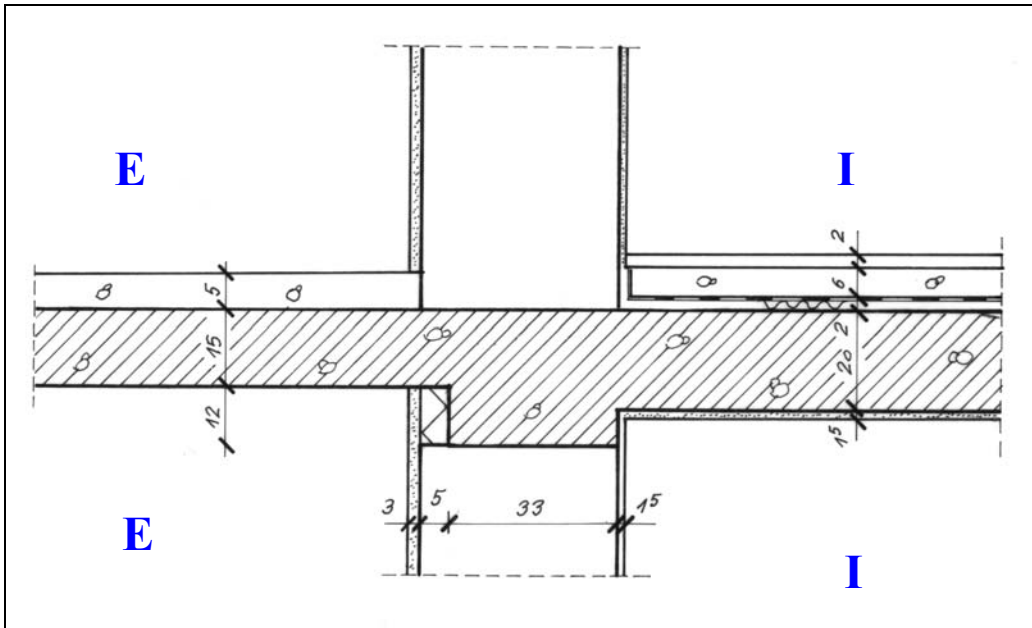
Designing a bracket balcony slab integrated with the floor, in a brick block wall
